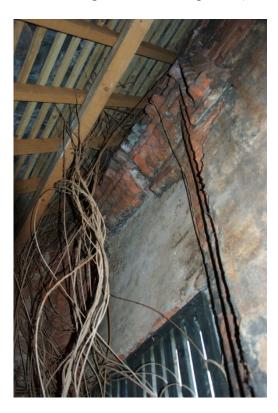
Brick hoodmould to window in south-west wall of former Range D
